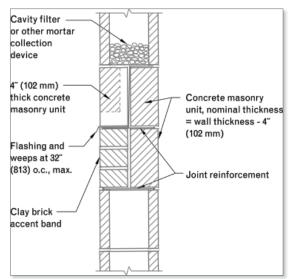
Multi-course clay brick band in unreinforced concrete masonry single wythe
